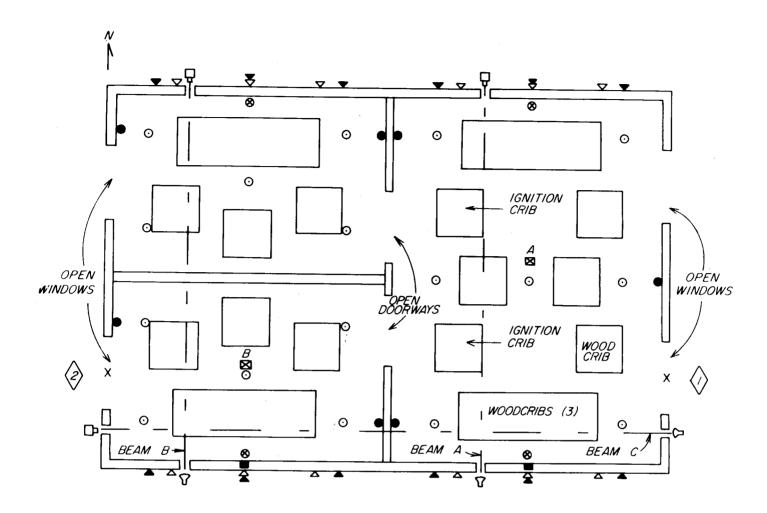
Plan view of sandwich and wood-frame test structures showing locations of wood cribs, thermocouuples, gas sampling points, and smoke-measuring apparatus.
